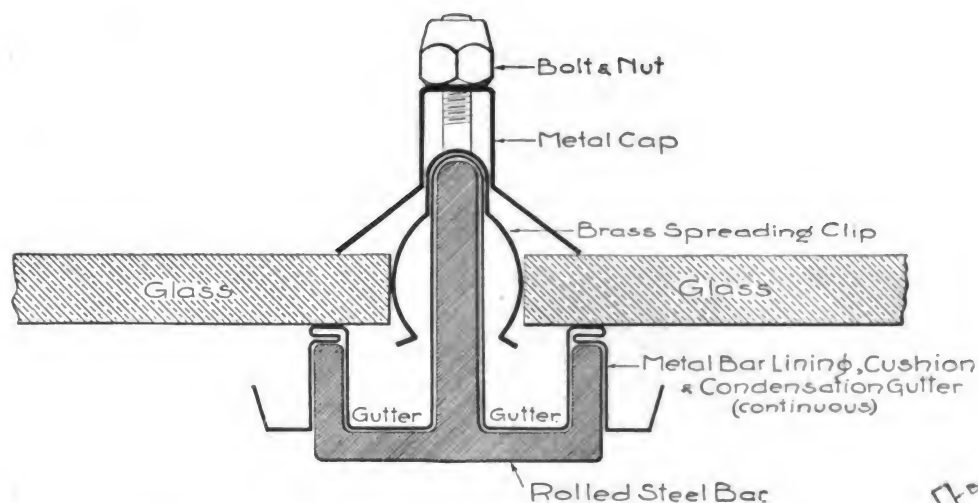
FULL-SIZE TRANSVERSE SECTION AT SKYLIGHT
